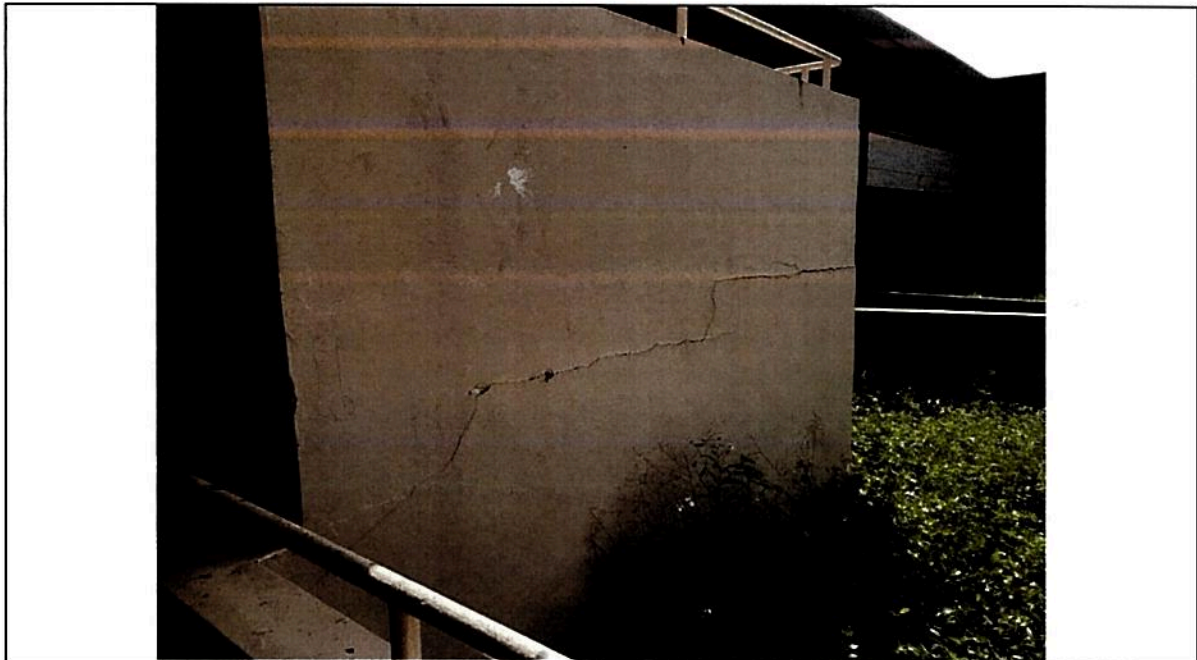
Stair step cracks at least at two CMU walls segments in the vicinity of the SE building expansion joint (dining hall/corridor wall) – Image shows corridor side
